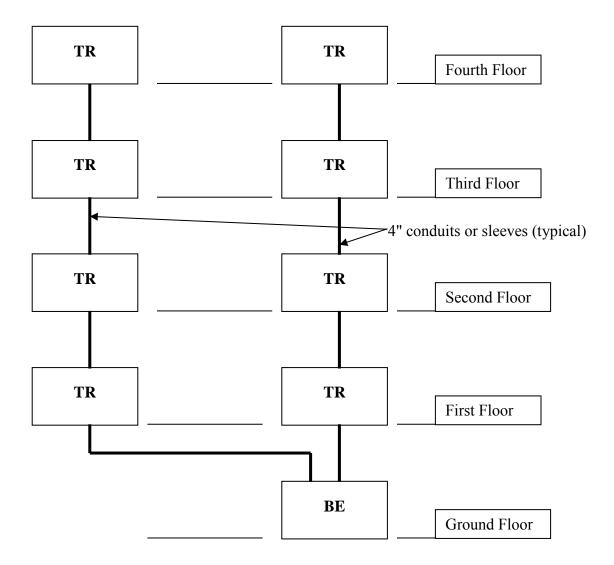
Typical Building Telecommunications Room Riser Diagram No Scale
